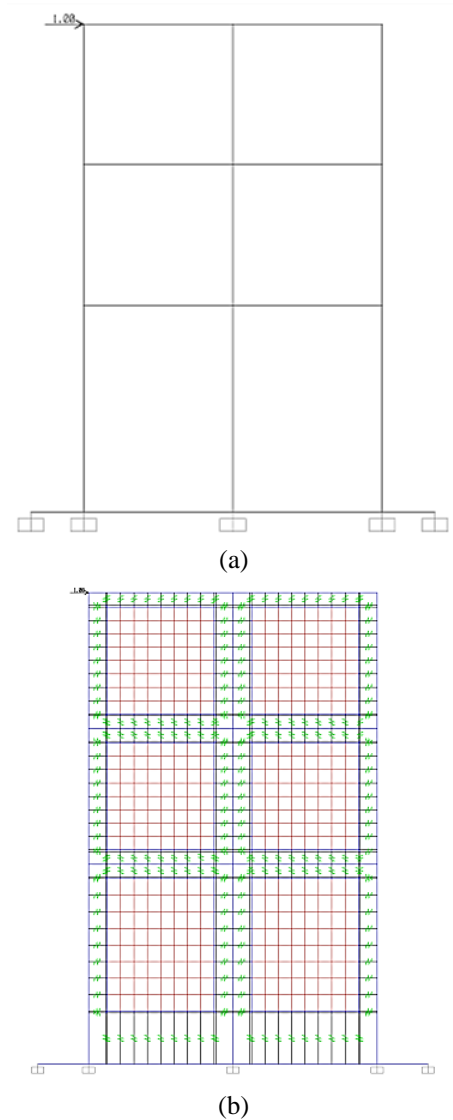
Application of loading on typical (a) bare frame and (b) infilled frame
